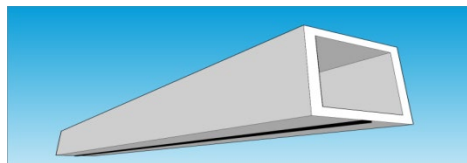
Simulation diagram of sheet strengthening steel box girder.
